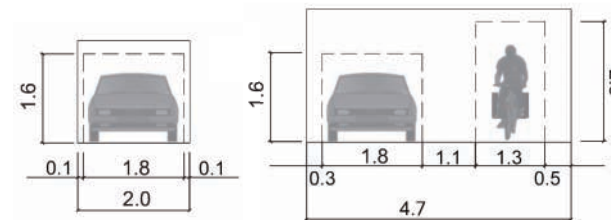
Motor Vehicle Design Dimensions (meters)
